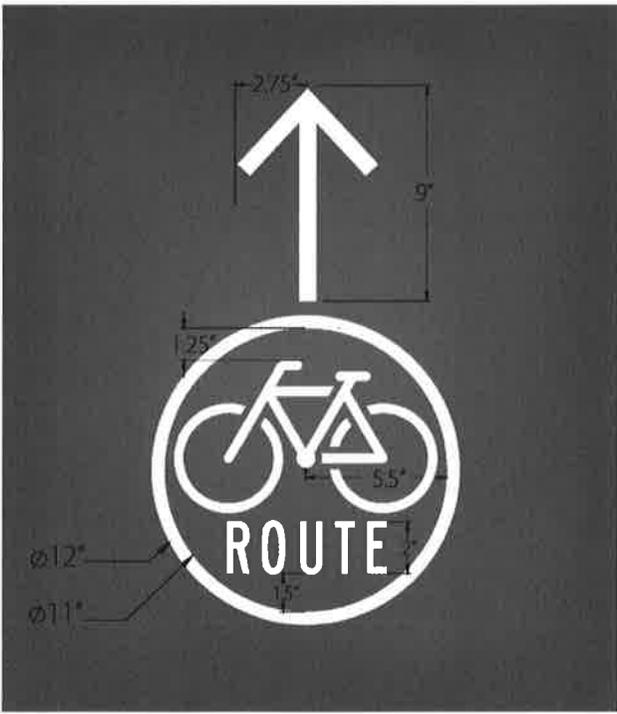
Proposed half-size Type 1 pavement marking symbols for off-street facilities
